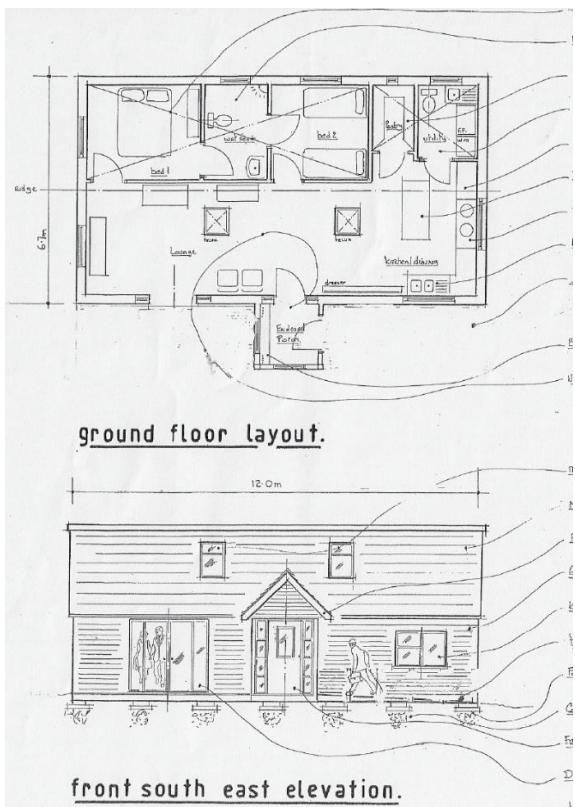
Plans submitted under refused application 73164 and withdrawn application 74608
